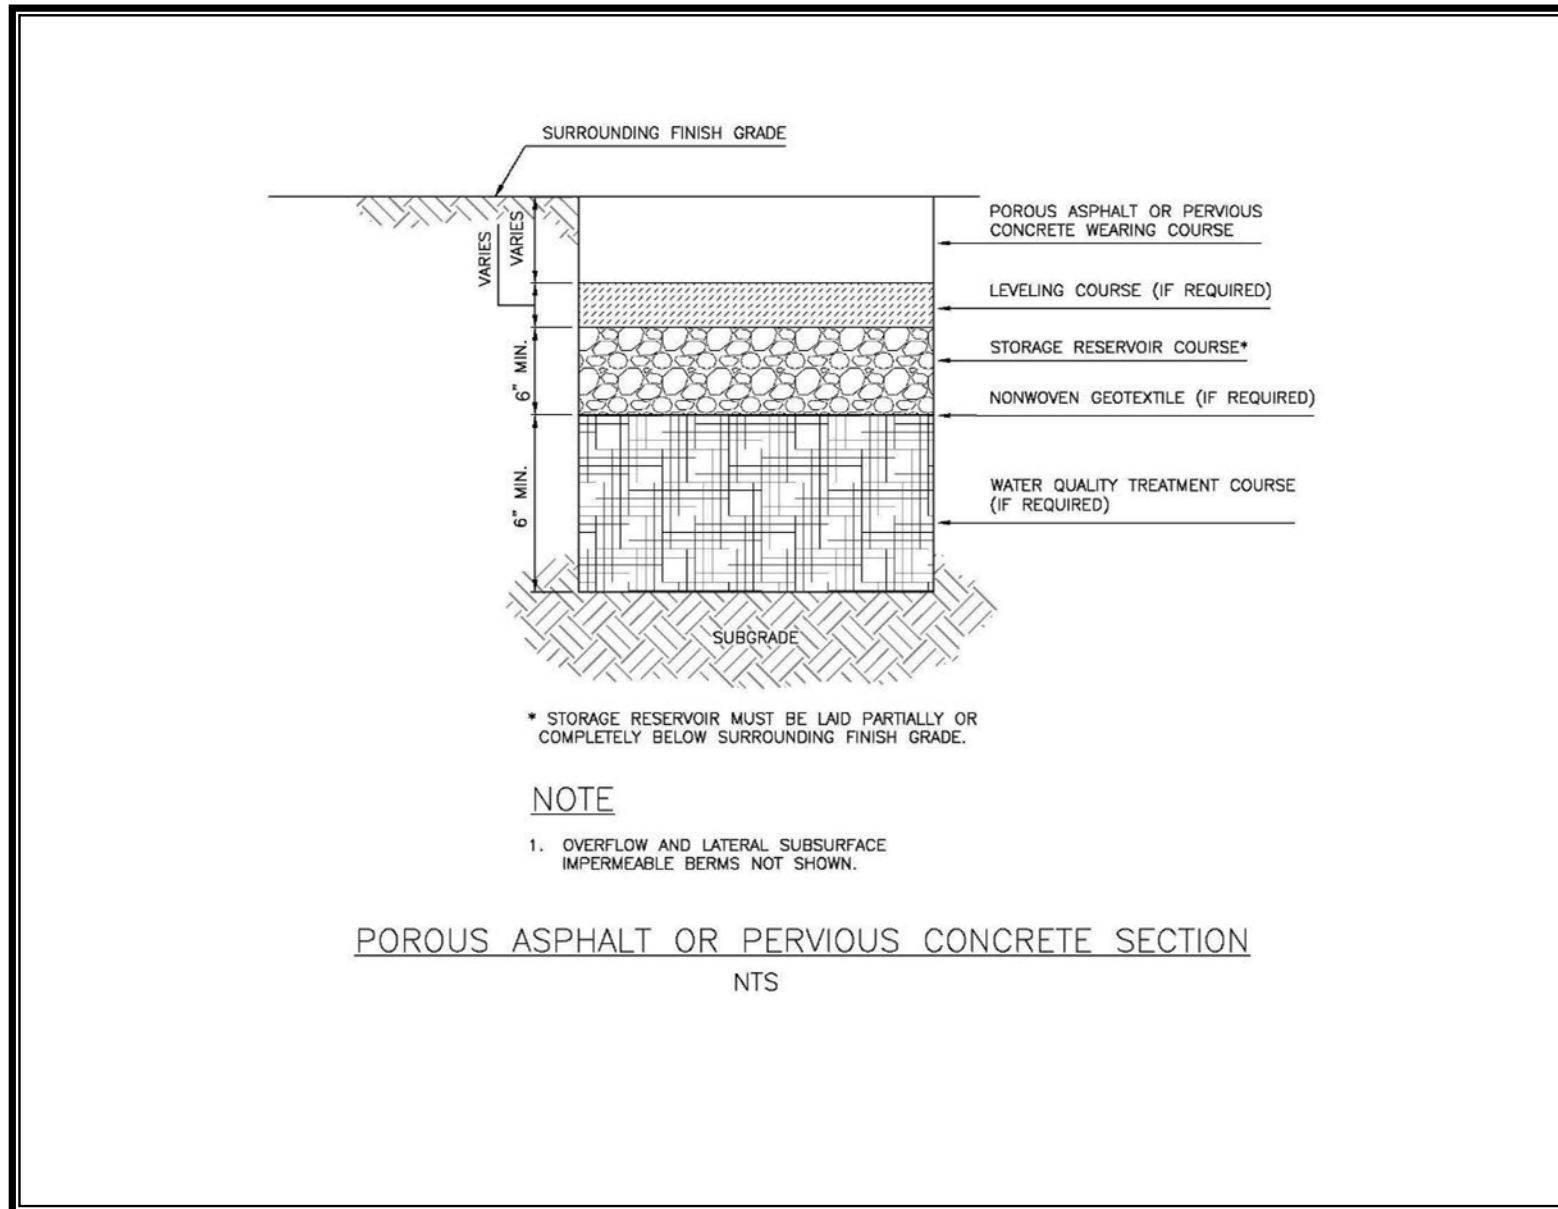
Porous Asphalt or Pervious Concrete Section.
